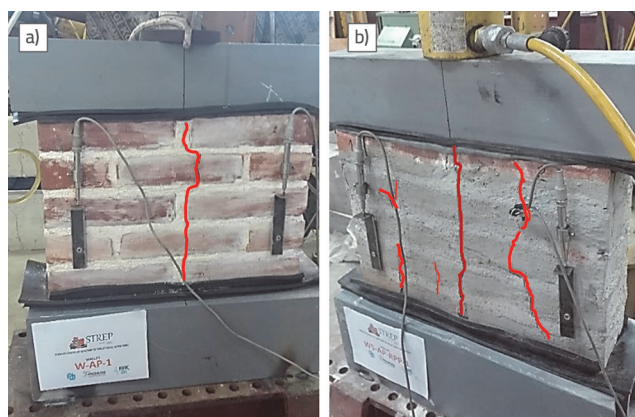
Typical failure mechanisms of masonry panel after compressive strength tests: a) URM panel (W-AP); b) SM panel (WS-AP-RPP)
